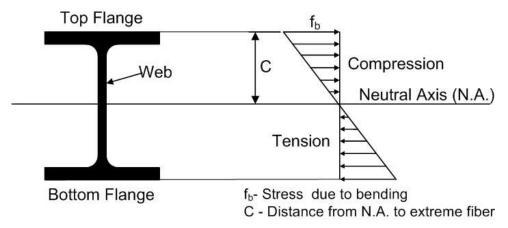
Girder Cross Section Resisting Positive Moment
